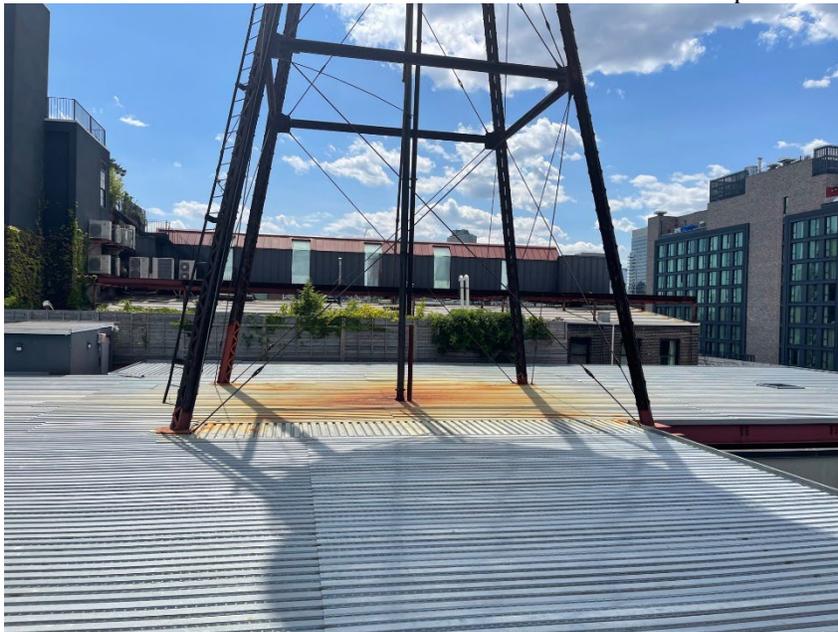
View of passive SSDS risers installed on roof for slab-on grade portion of building.
